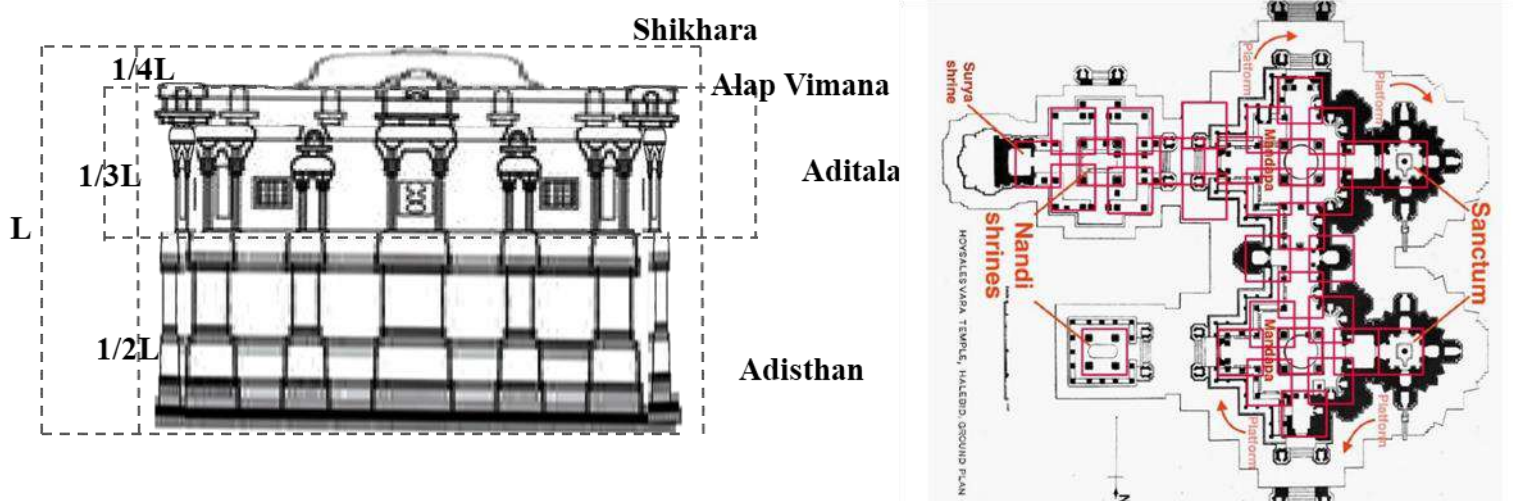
Elevation and plan Hoysaleswara temple at Halebidu . (Goud, S. 2017). (recreated by author)
